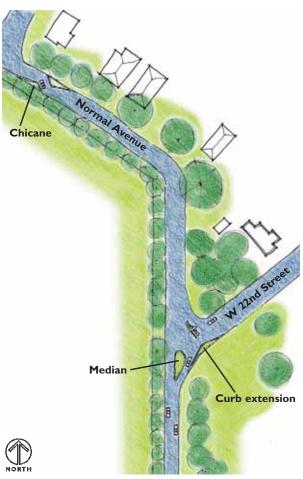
Potential Traffic Calming using medians and chicanes on Normal Avenue and West 22^{nd} Street.
